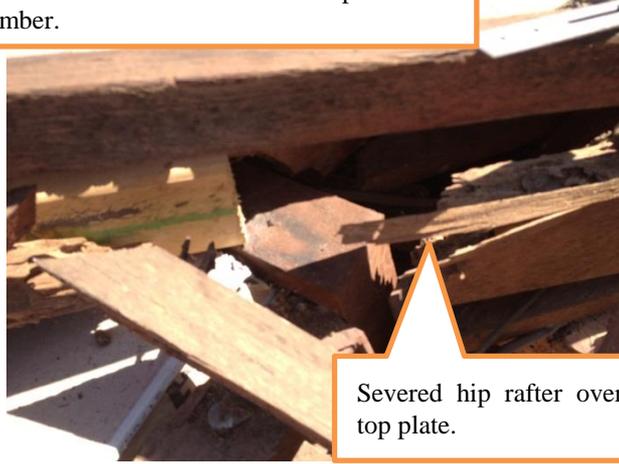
Hip rafter adjacent top plate has been severed by previous infestation. Note pine chock to support where it doesn't adequately land on top plate.
